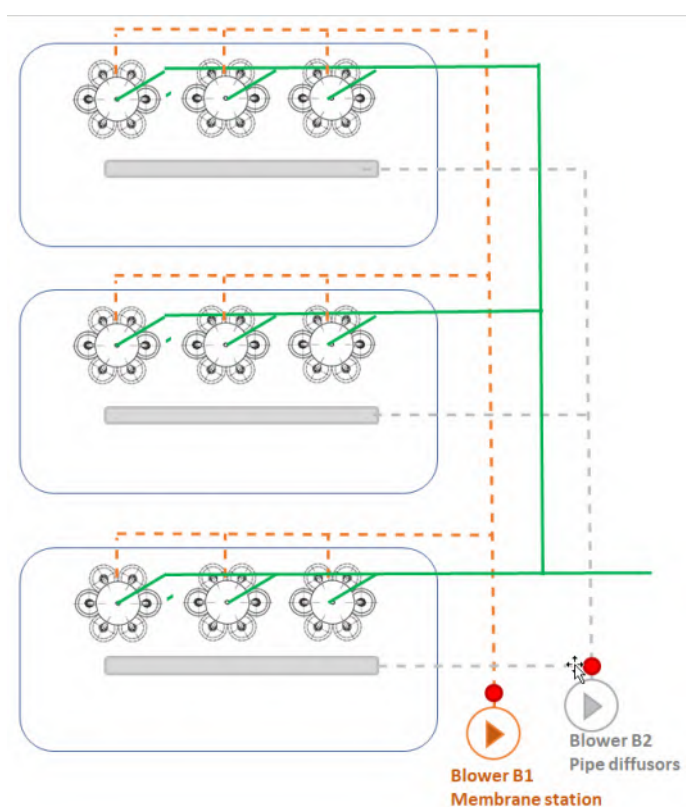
Overview pipe connection to the central pipe to blower B1 and B2
